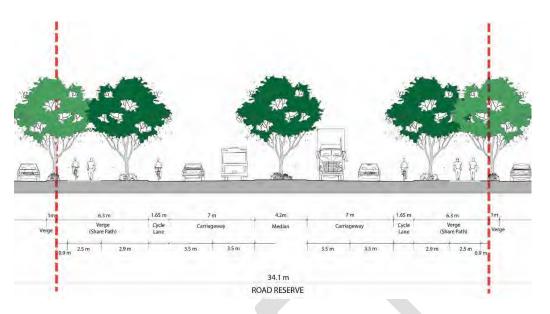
Sub-Arterial Road Cross Section (On-Road Cycle Lane)
